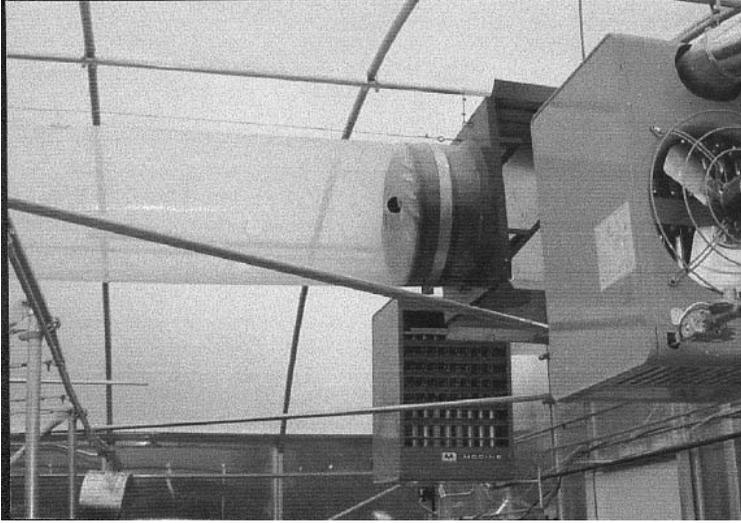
Natural gas- or propane-fired jet fan heater placed in the gable at the ventilation fan end of the greenhouse (common method of heating and dispersing hot air into a greenhouse).
